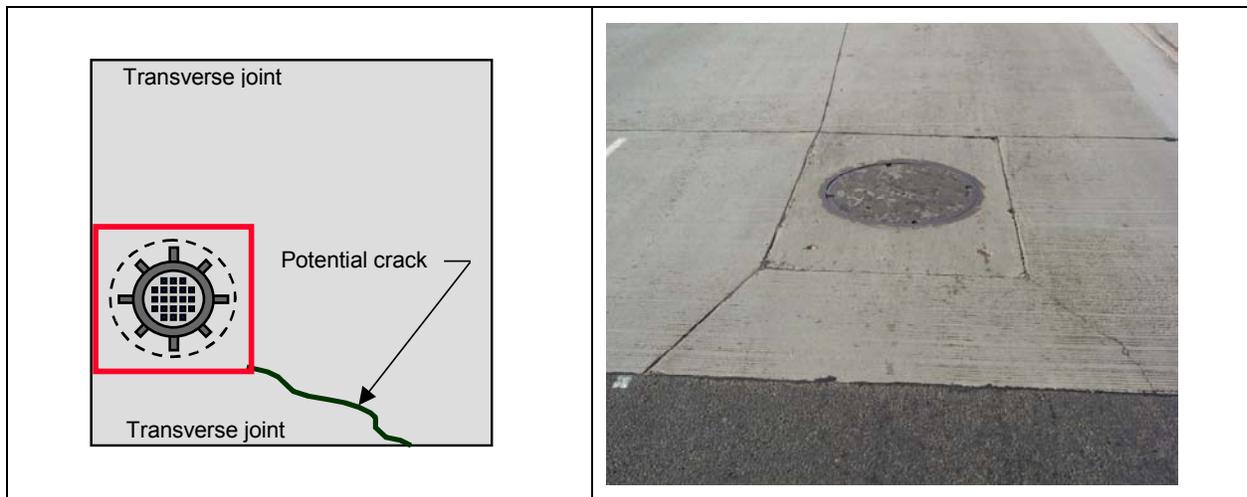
Cracking that will typically occur when boxouts are placed near a transverse joint leaving small rectangular shapes (figure courtesy of American Concrete Paving Association. Photo taken at SR 2, Division and Third Avenue intersection).
